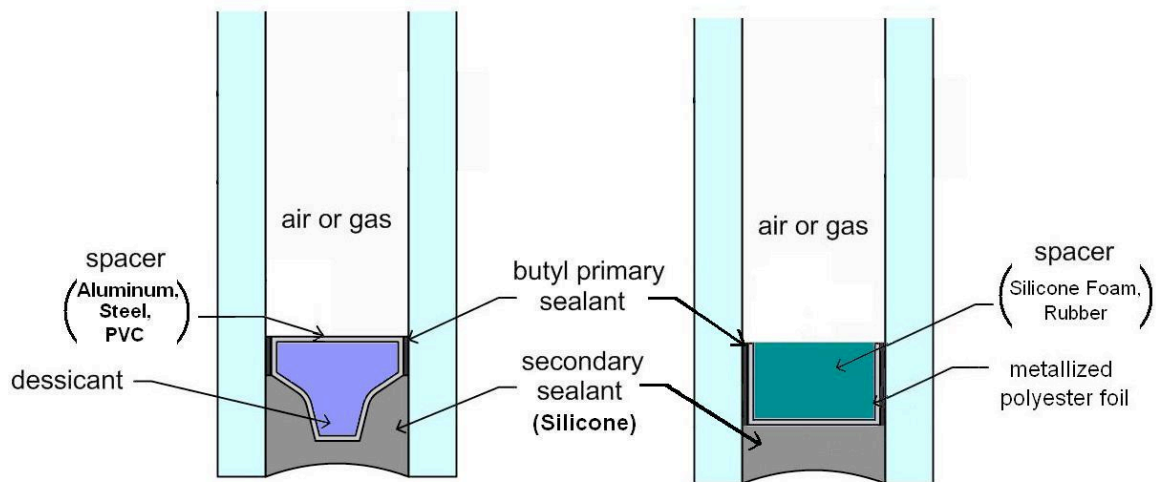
Edge spacer construction (adapted from Carmody, 2007)
